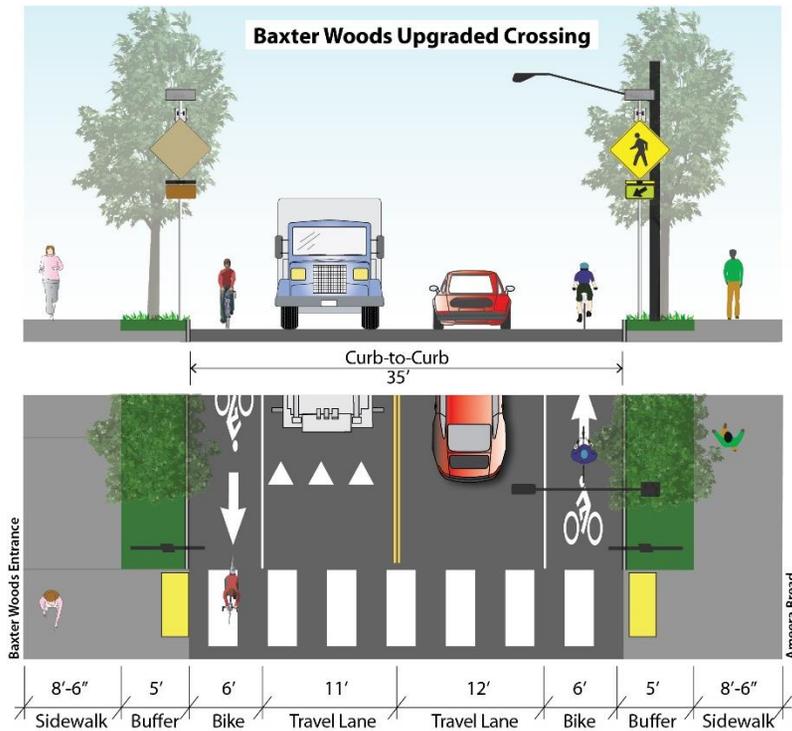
Upgraded Crosswalk with Rectangular Rapid Flashing Beacon and Pedestrian Neckdowns at Entry to Baxter Woods
